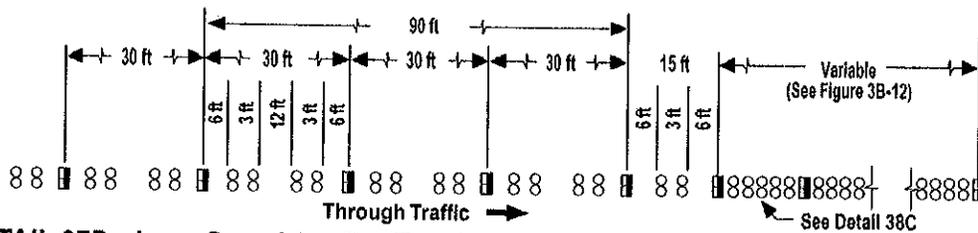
B - Lane Drop Markings at Conventional Highway Intersections
